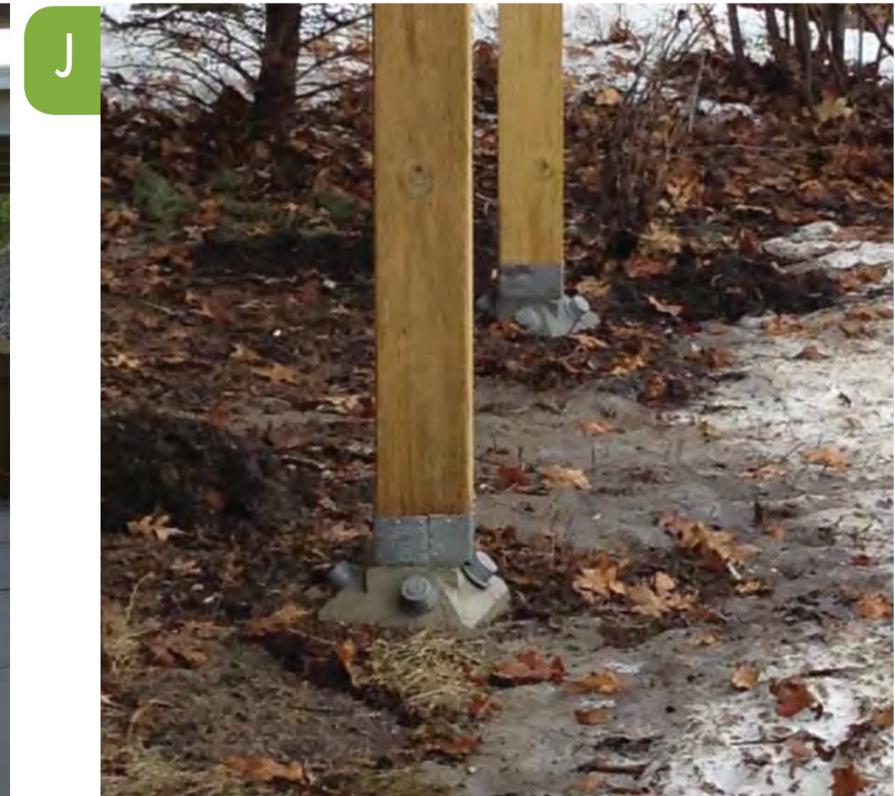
J: Pin Pile Footings (Image Courtesy of Diamond Pier)
